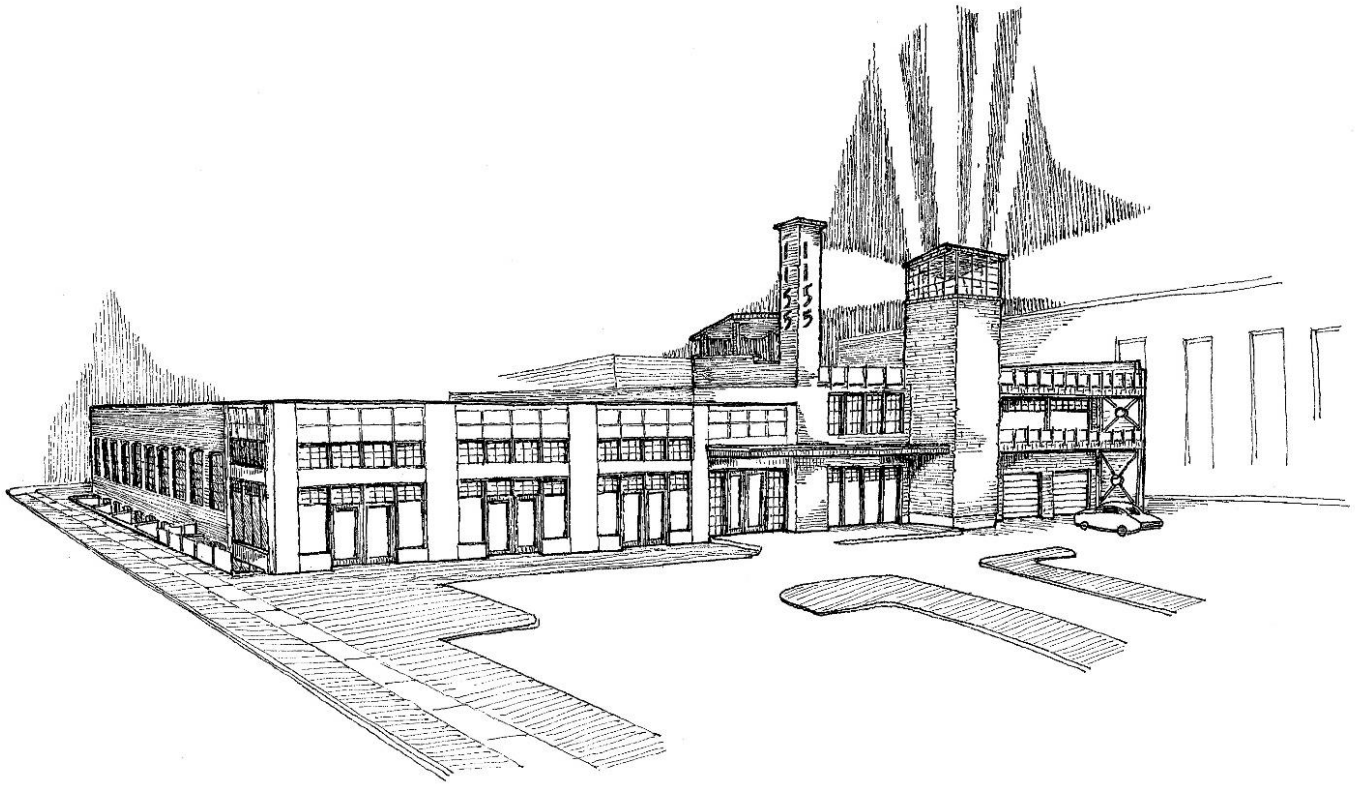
1153-1155 Dundas Street rendering- King Street perspective
